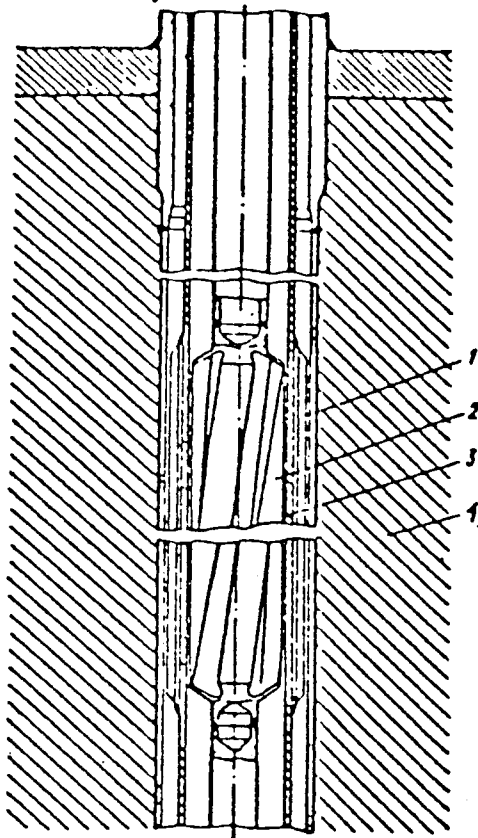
Position of shielding plug in fuel channel: (1) steel sleeves; (2) helical steel plug; (3) channel tube; (4) serpentine filling
